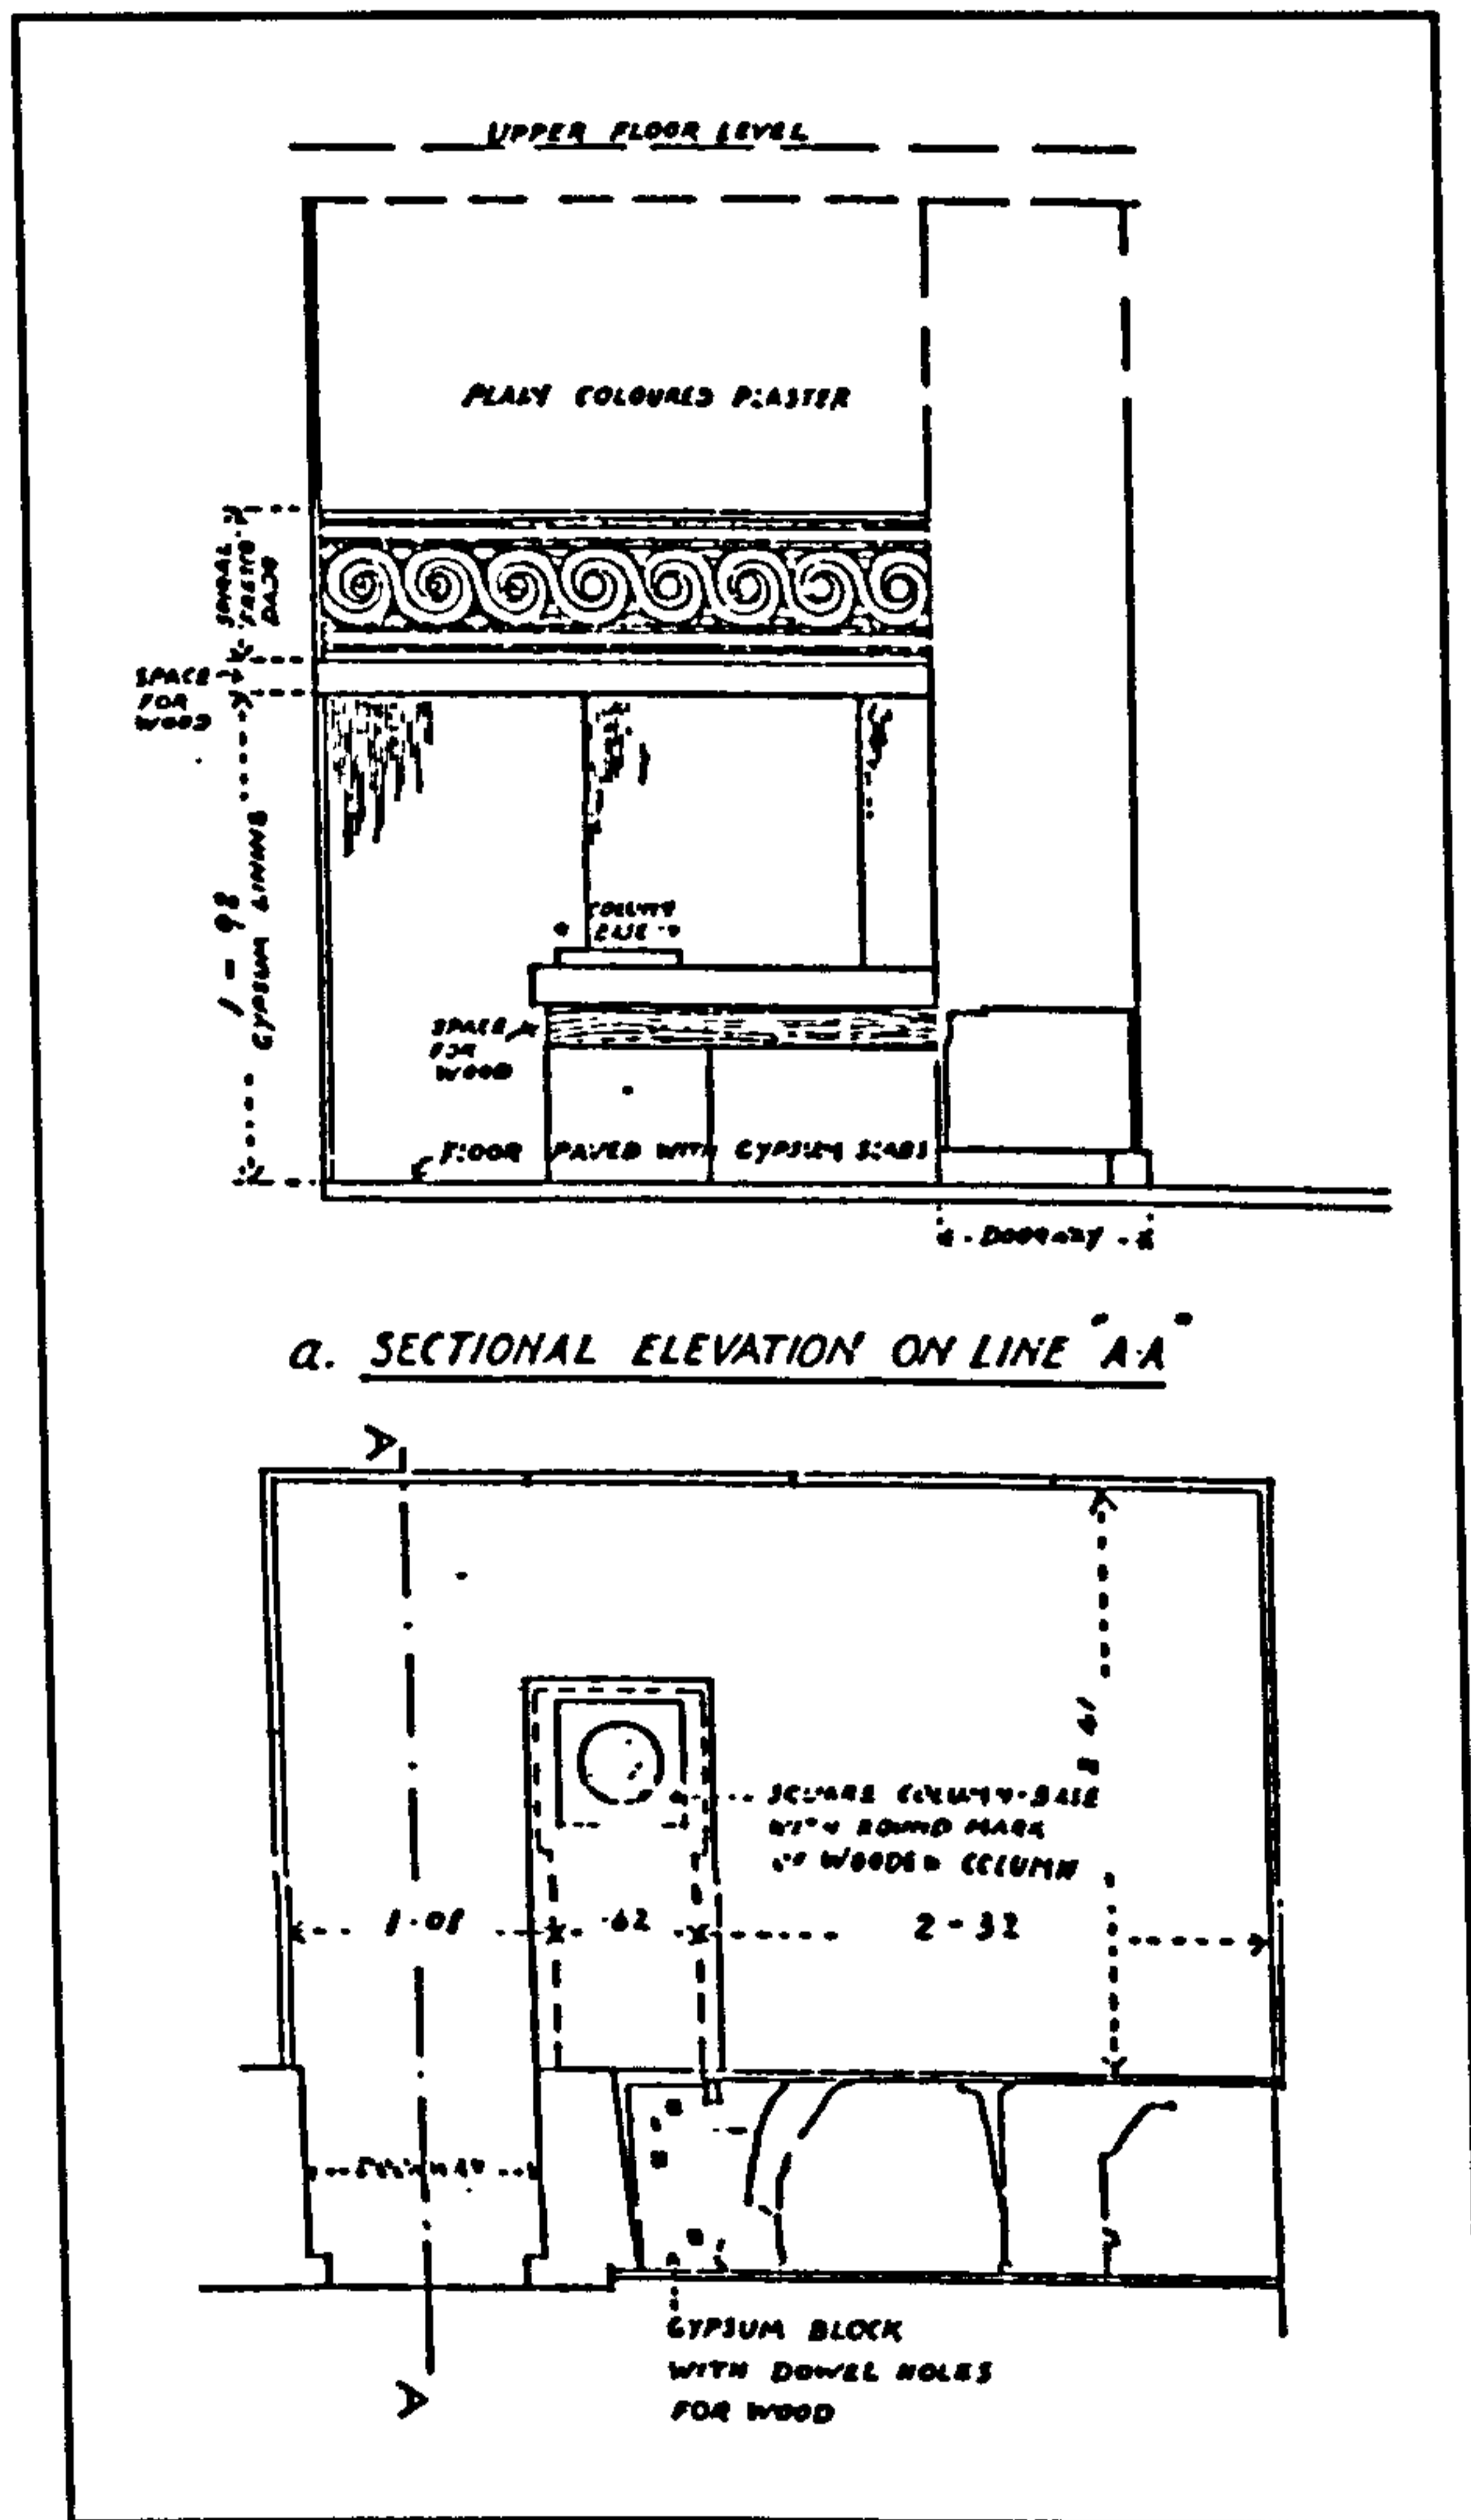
Plan and Elevation of the Bathroom with the spiral frieze. Theodore Fyfe, 1902.
